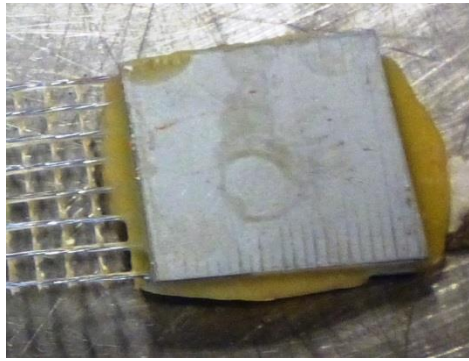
Plates glued to the loaded end of the reinforcing steel strips for the loading to be transmitted uniformly.
